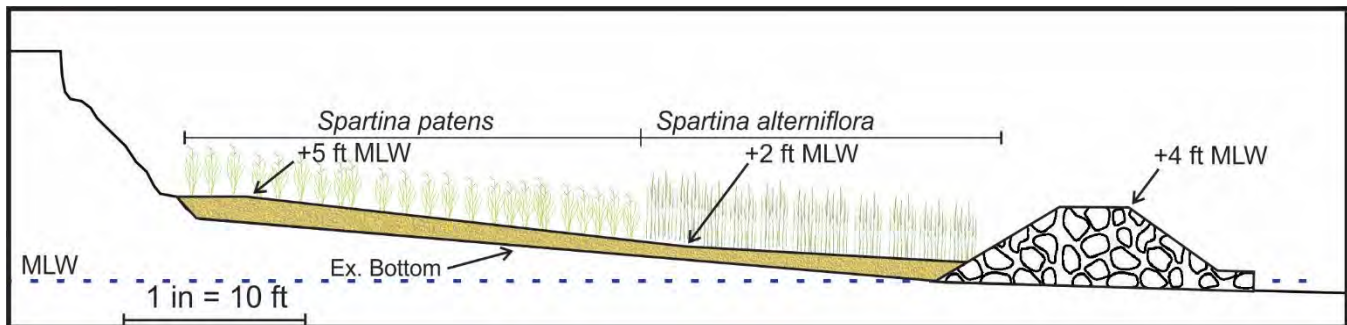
Typical cross-section for the sill structures at the Visitor's Center.
